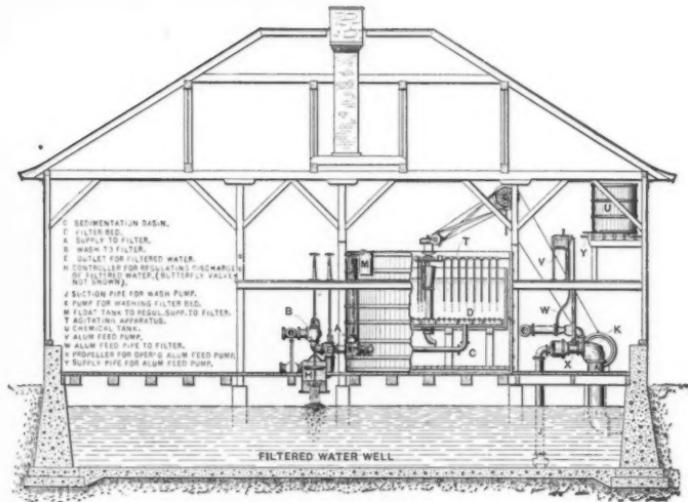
SECTIONAL ELEVATION THROUGH FILTER HOUSE.
